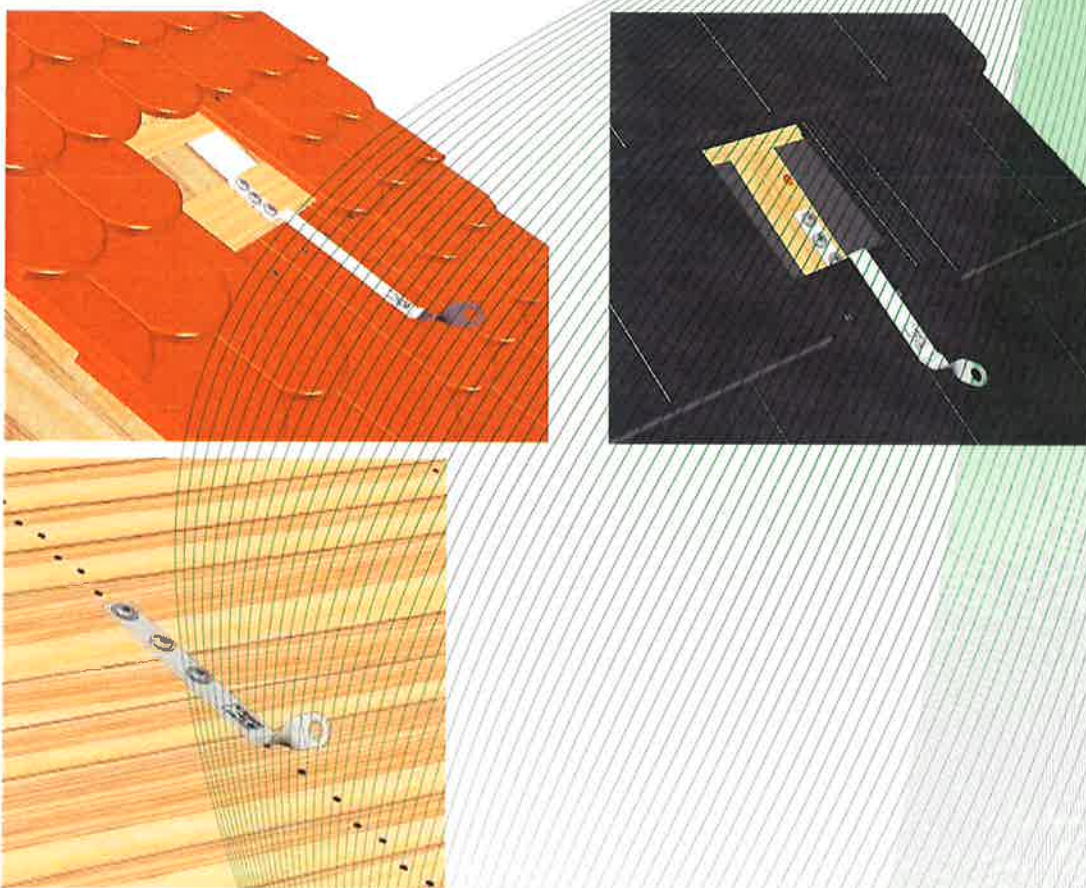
Anchor device of type LUX-top® SDA (assembly examples)
